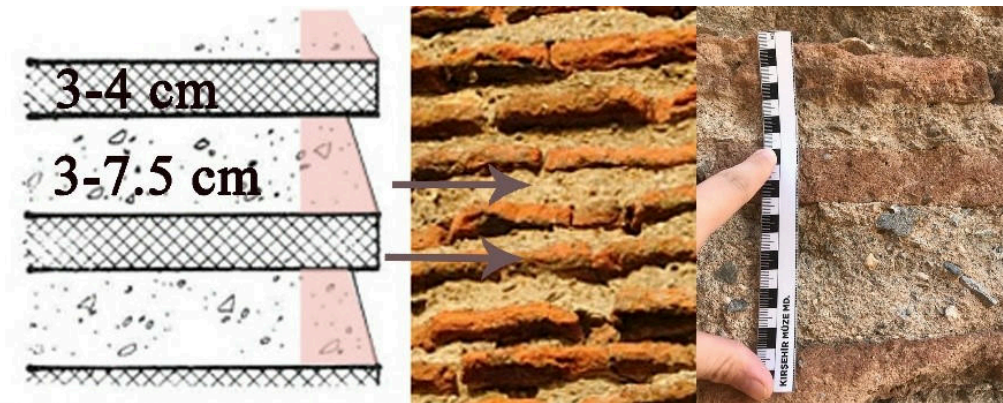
(a) Structural wall detail of Üç Ayak Church.
